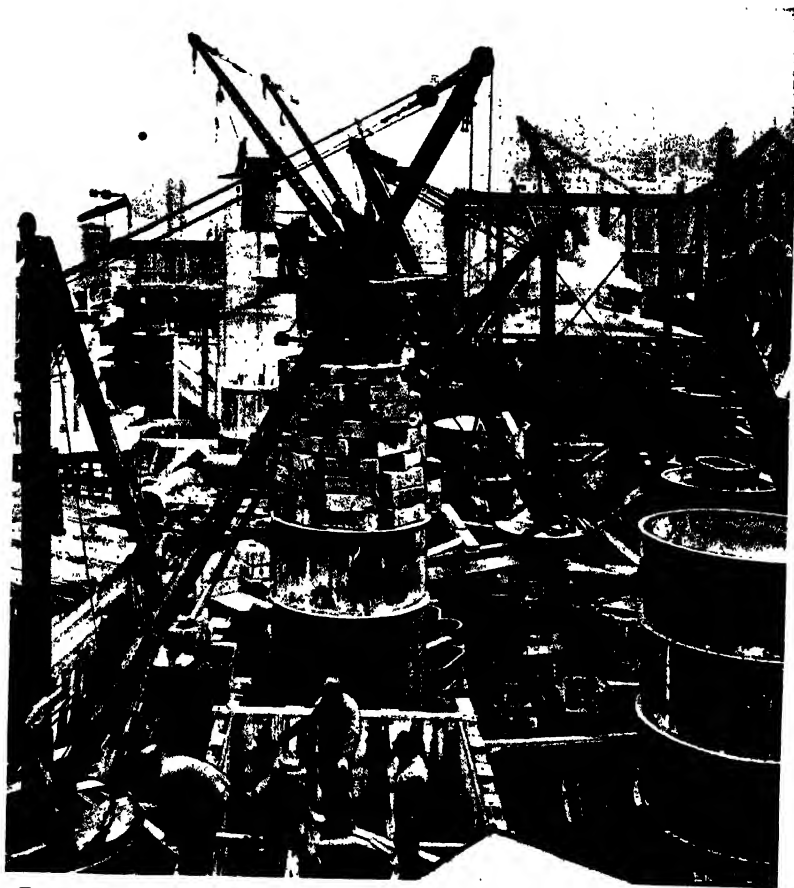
Sinking and Concreting Caissons, with Steel Forms. Municipal Building.
